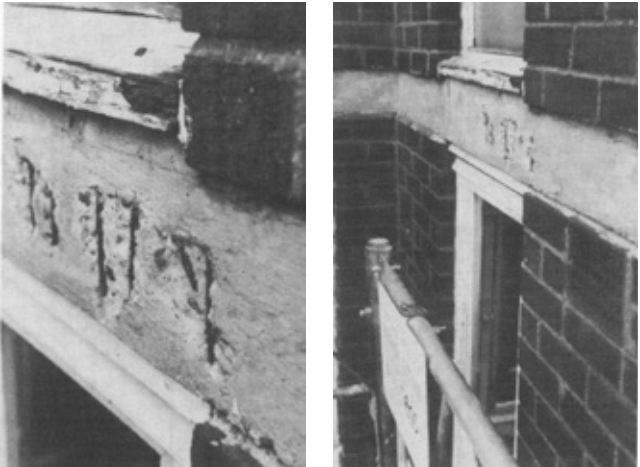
Parsons House prior to overcladding – spalling concrete and rotten timber windows
